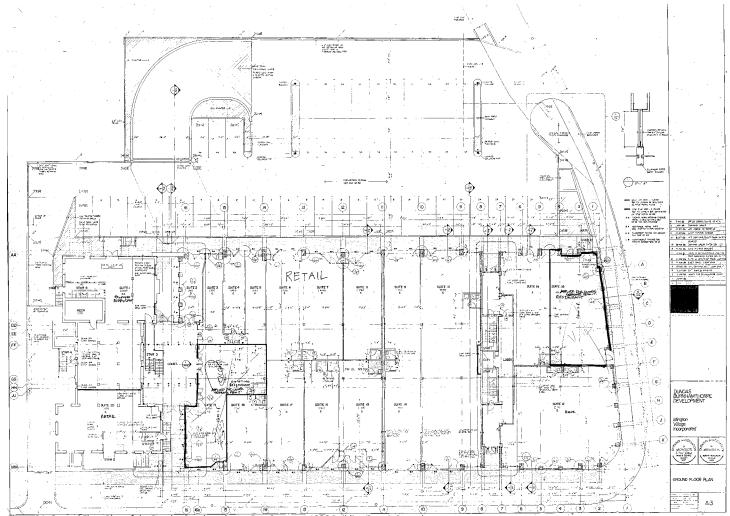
Ground Floor Plan of the Dundas Burnhamthorpe Development, 1986 Building Permit Records
